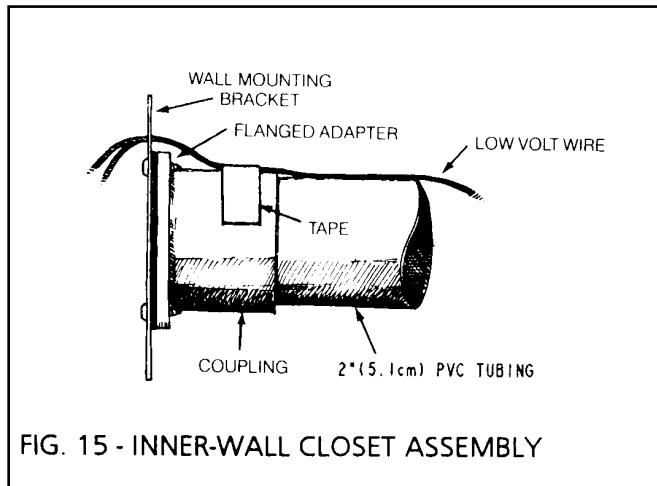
INNER-WALL CLOSET ASSEMBLY
